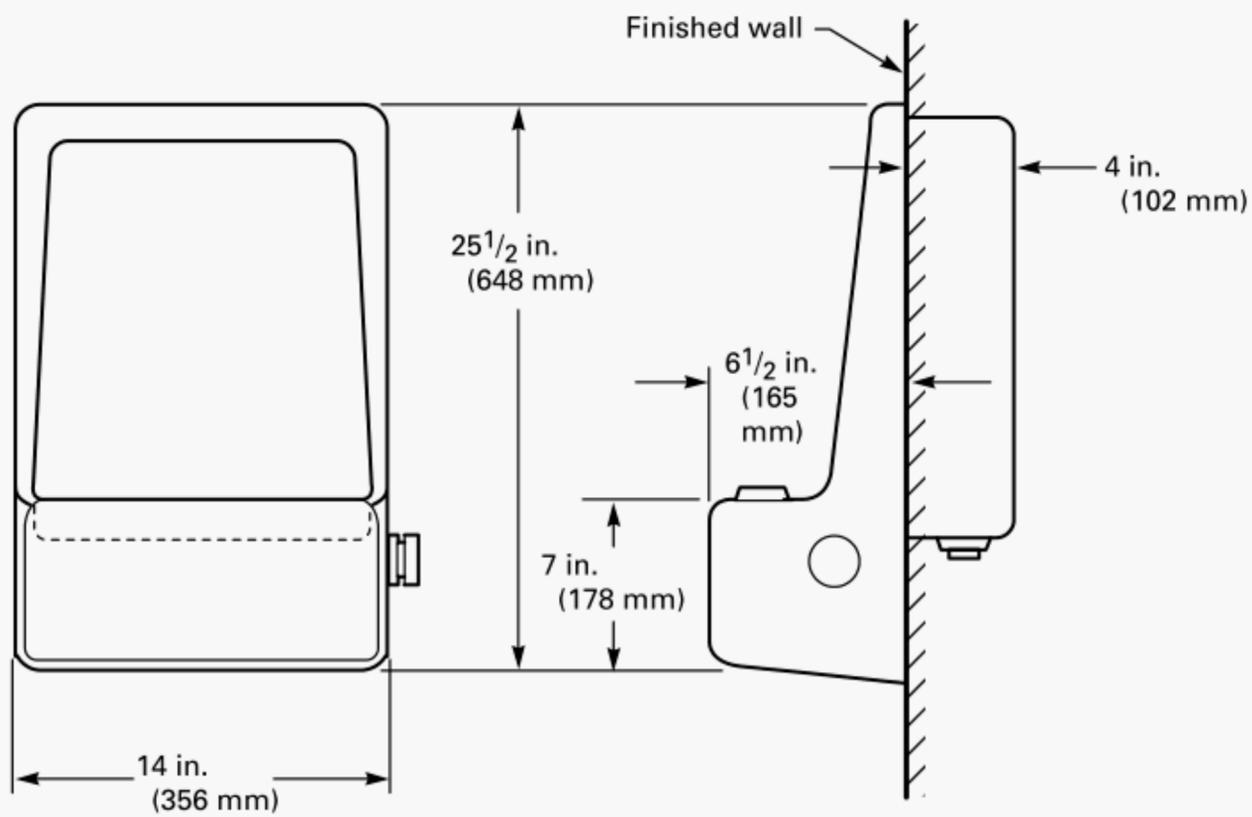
Wall-Mounted Washout Urinal With Bottom Outlet
